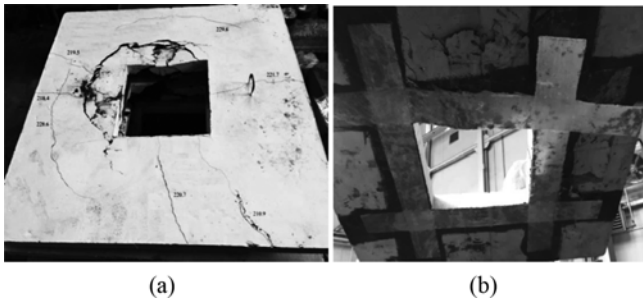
The Failure Mode and Cracking Pattern for Slab SOGM1: (a) Compression Side, (b) Tension Side
